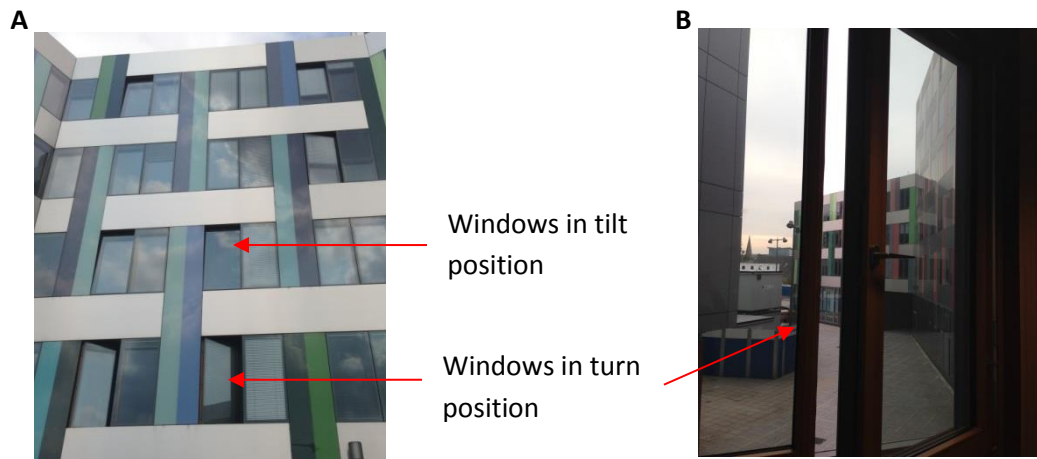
Single skin façade of Building 1: (A) Elevation of façade showing windows open in the turn position and windows in the tilt position; (B) Window opened in the turn position in Building 1
